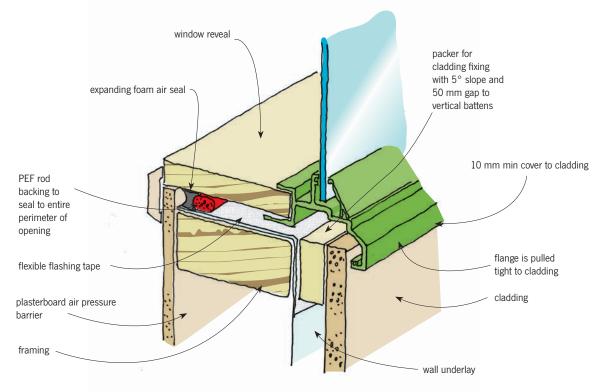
Air seal to cladding penetration (window example) with drained cavity.
